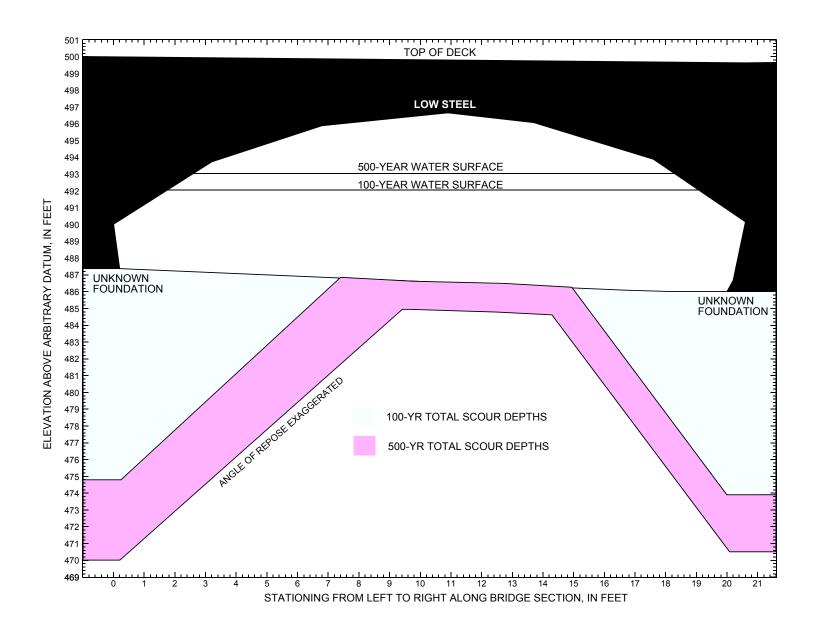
Scour elevations for the 100-yr and 500-yr discharges at structure STOWTH00160039 on Town Highway 16, crossing Moss Glen Brook, Stowe, Vermont.
